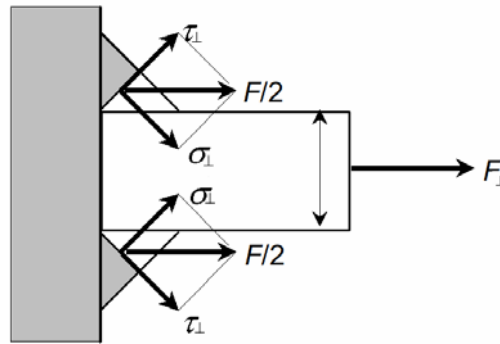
Double fillet welded joint loaded perpendicularly to the weld axis (CEN 2002).
